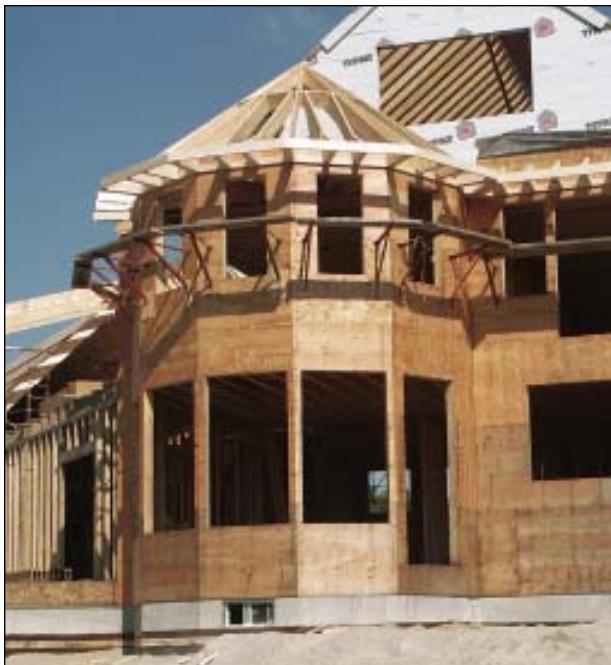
Using a pure geometric form helps maintain simplicity and symmetry in design massing, as well as in construction details such as roof framing.
